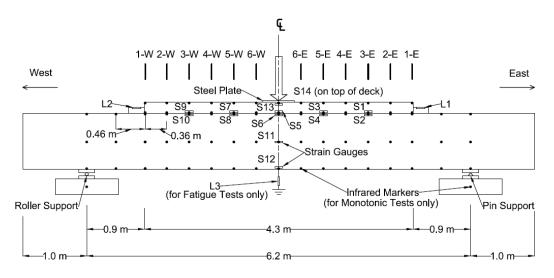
Elevation view of composite girder [1 m = 39.4 in.]
